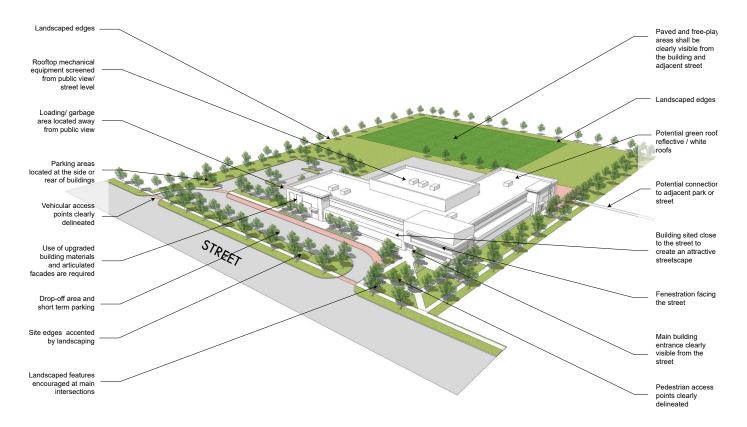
Conceptual Demonstration Plan For Elementary School
